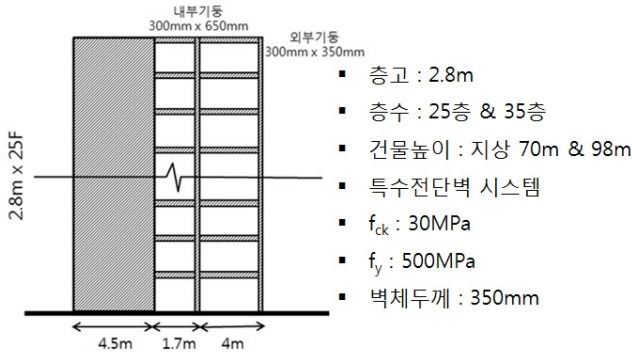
Floor plans and elevations of shearwall system(Continued)
